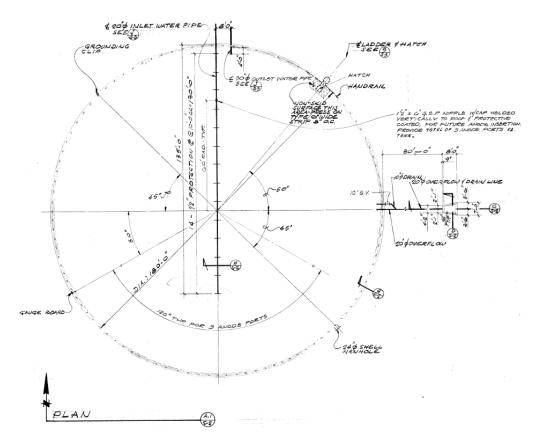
Site Plan (Sheet S-2 From Koebig and Koebig)
